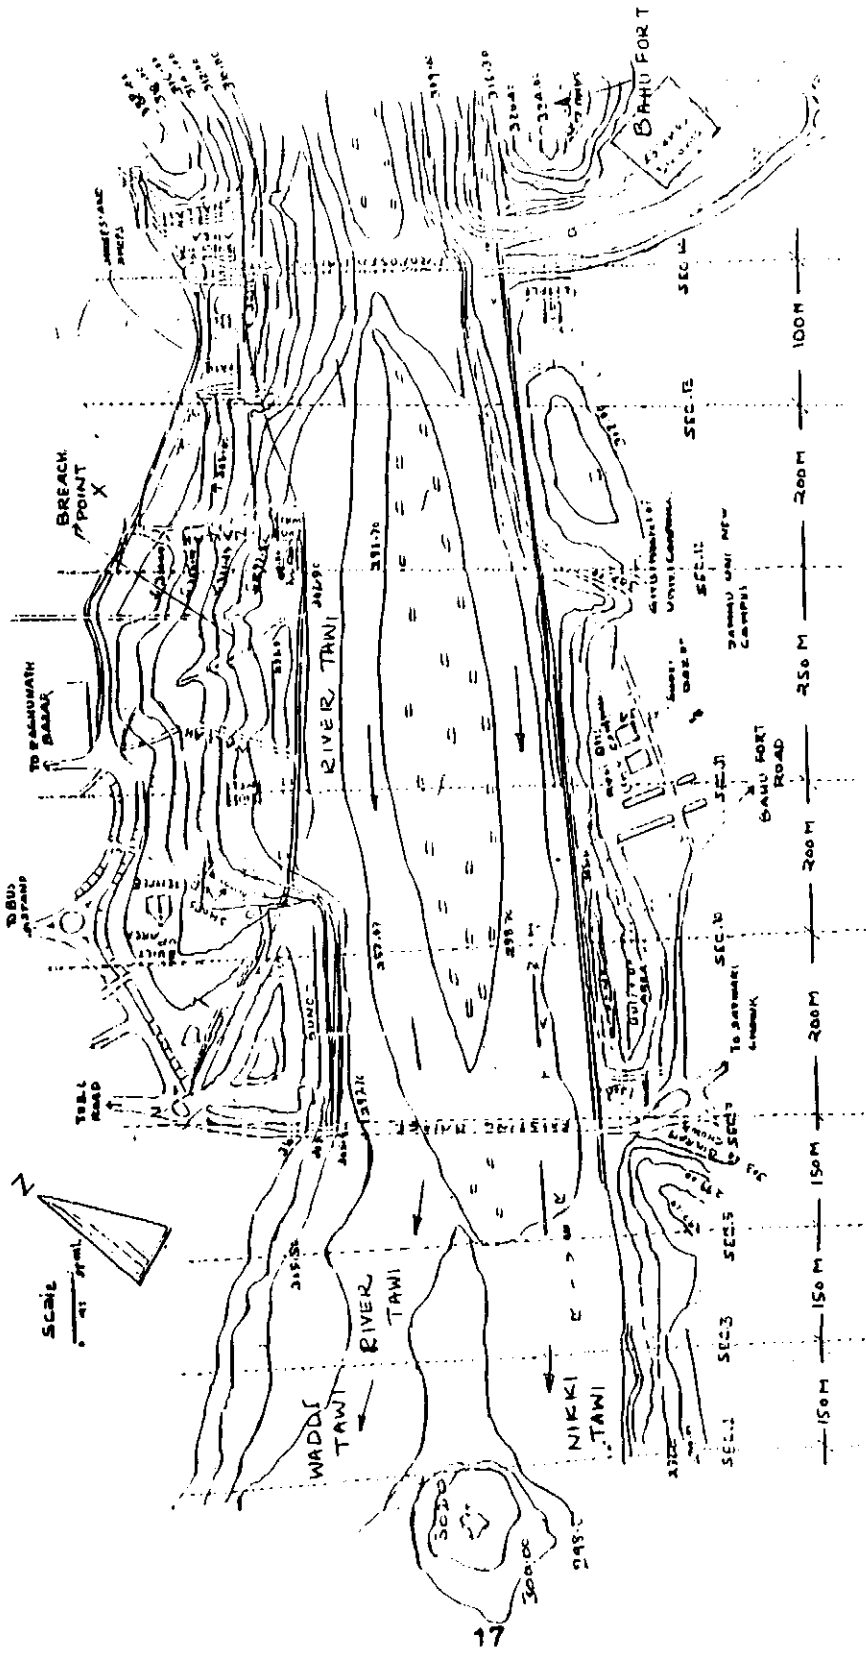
RIVER TAWI NEAR BRIDGE SITE JAMMU
